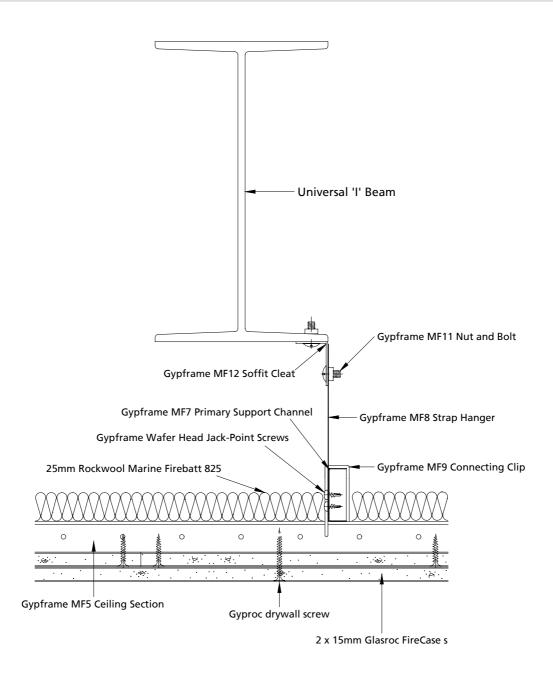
Cross-section of specimen showing British Gypsum CasoLine MF detail.
